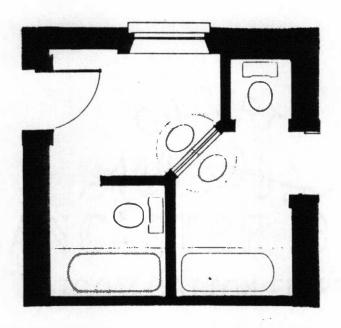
Revised layout of the divided upstairs bath. Source: Plans for the Fairfax Inn, Brewer, Ingram and Fuller Architects, Knoxville, Tennessee.
